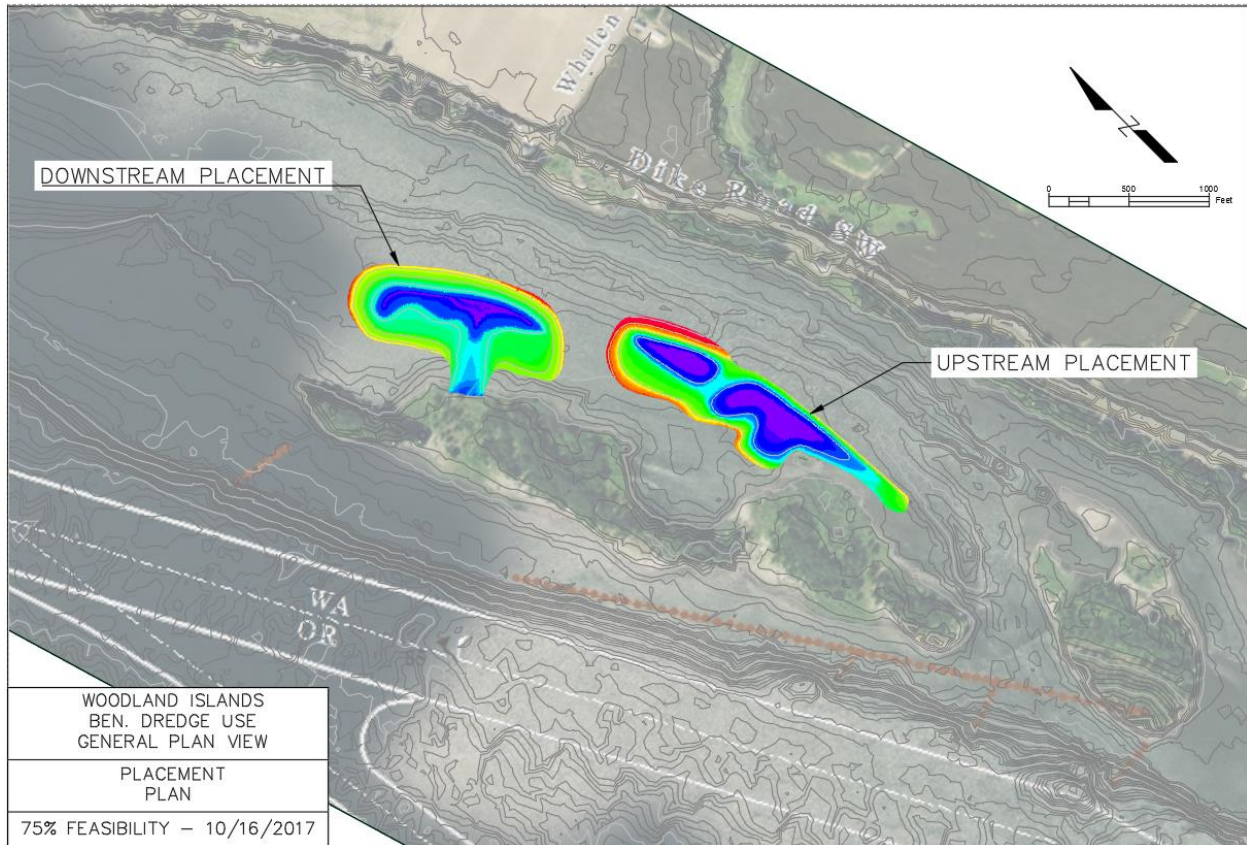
Potential Terrain Layout for Recommended Plan, 400 kcy, split placement with complex grading.
